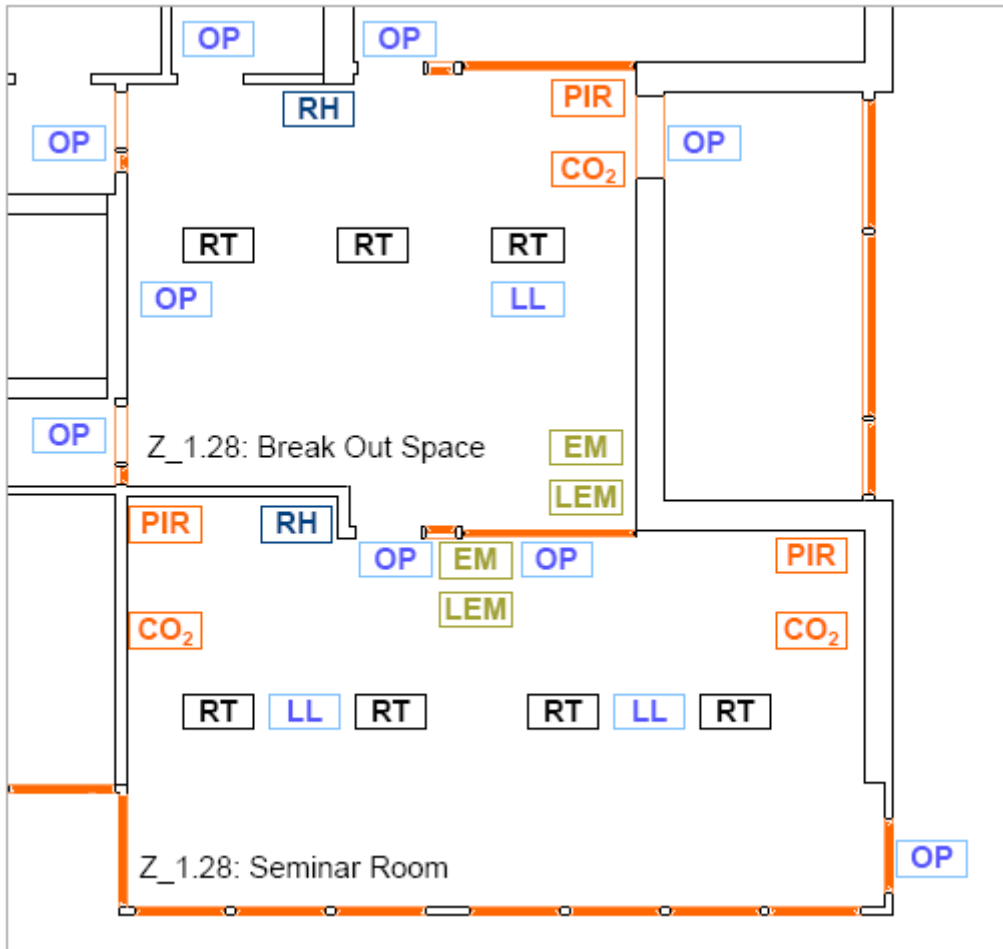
Detail Z_1.28: Break Out Space and Z_1.28: Seminar Room
